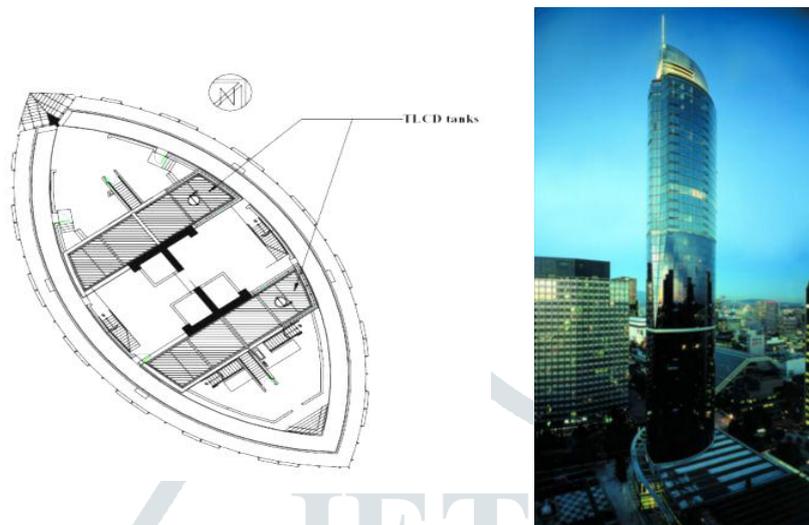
One Wall Centre and Cross-sections of One Wall Centre
